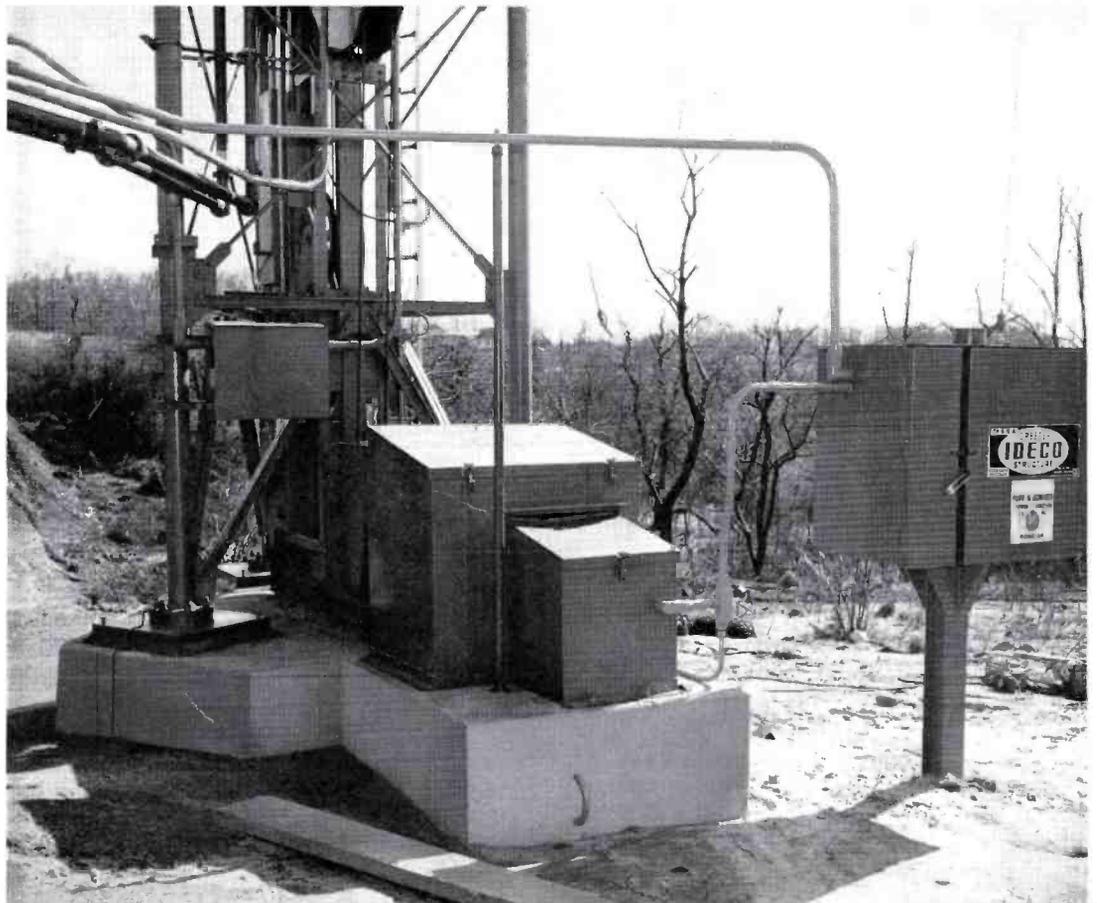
Base of tower is an 11-foot deep, reinforced concrete foundation, six feet square with only two feet extending above ground. The two-man, radio-controlled elevator, noted by letter A, is shown in above photo.
